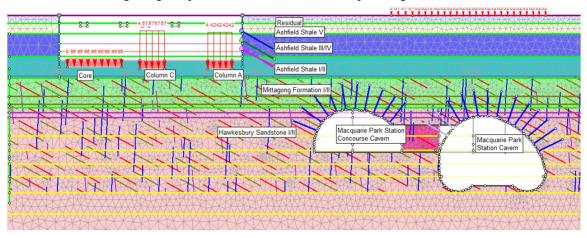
Geotechnical model for the section adjacent to station concourse and cavern
